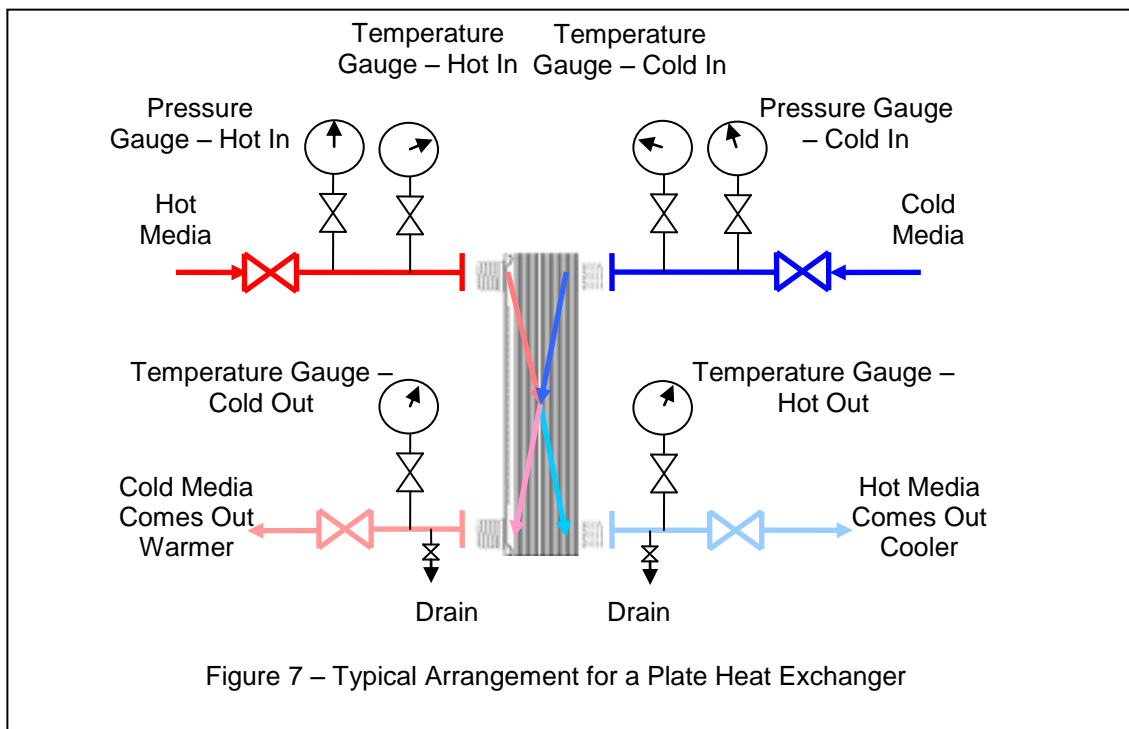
Typical Arrangement for a Plate Heat Exchanger
